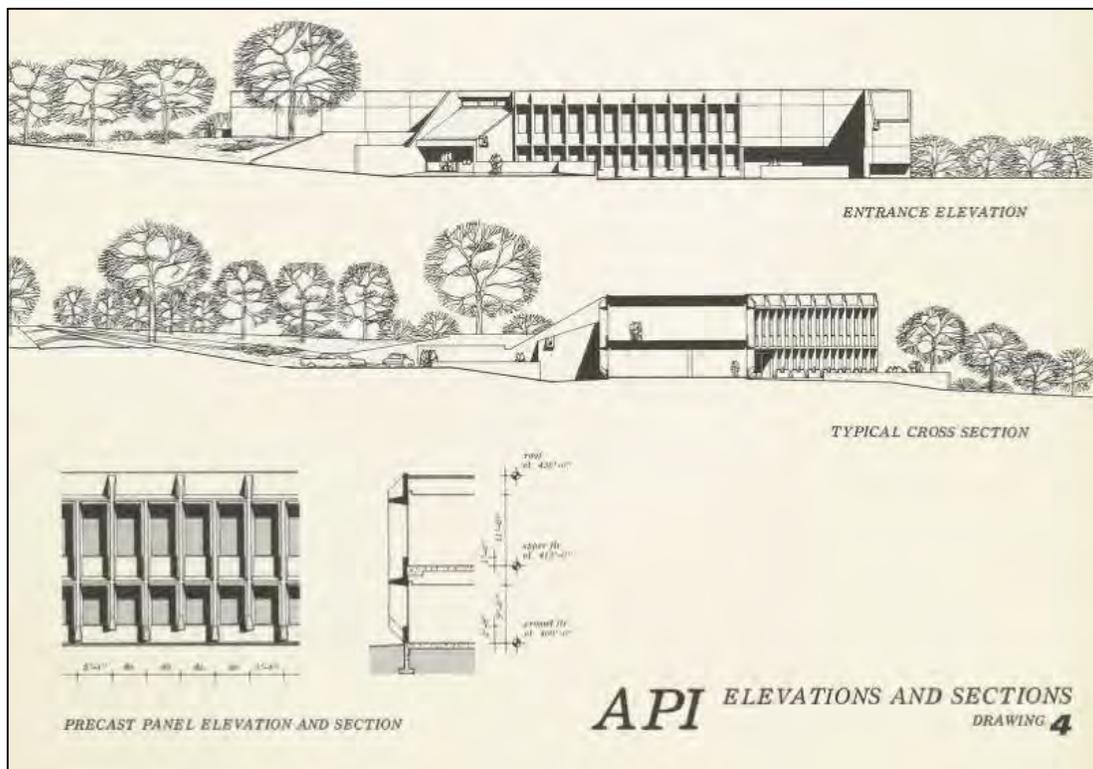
API Elevations and Sections (Marcel Breuer Digital Archives)
